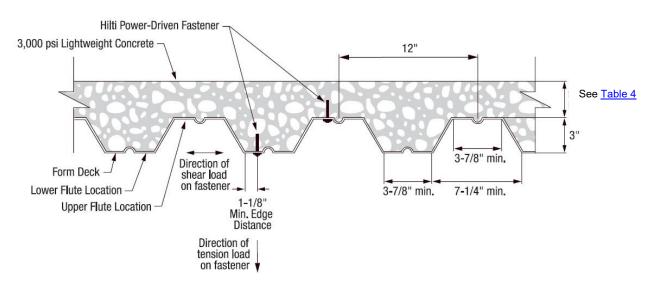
HILTI FASTENER LOCATIONS IN 3-INCH-DEEP COMPOSITE FLOOR DECK PANEL
